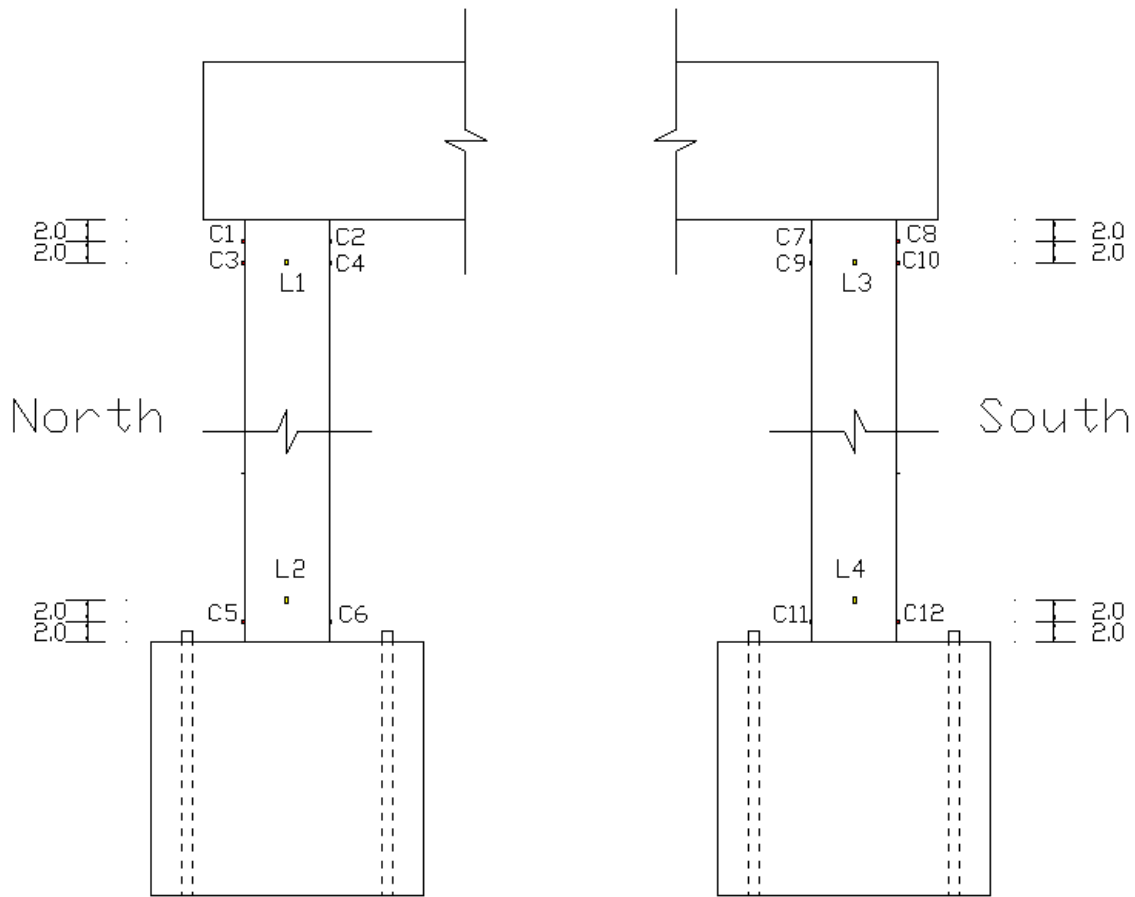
Layout of circumferential and longitudinal strain gages of FRP specimens
